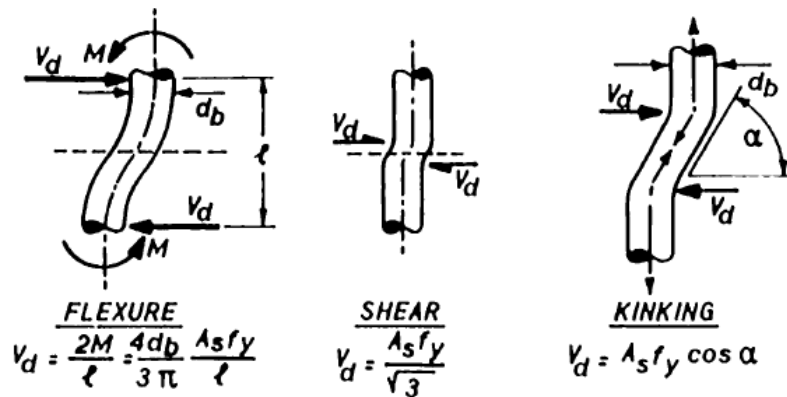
Mechanisms of Reinforcing Steel Dowel Action across Construction Joint (Paulay, et al., 1974)
